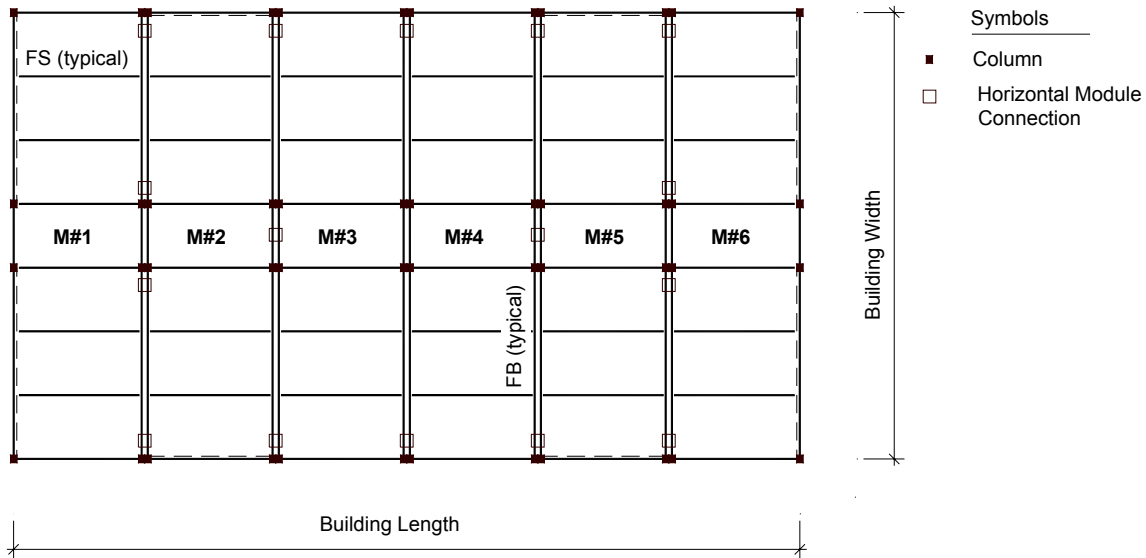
Plan View of a Typical Floor of a Four-Storey Modular Steel Structure
